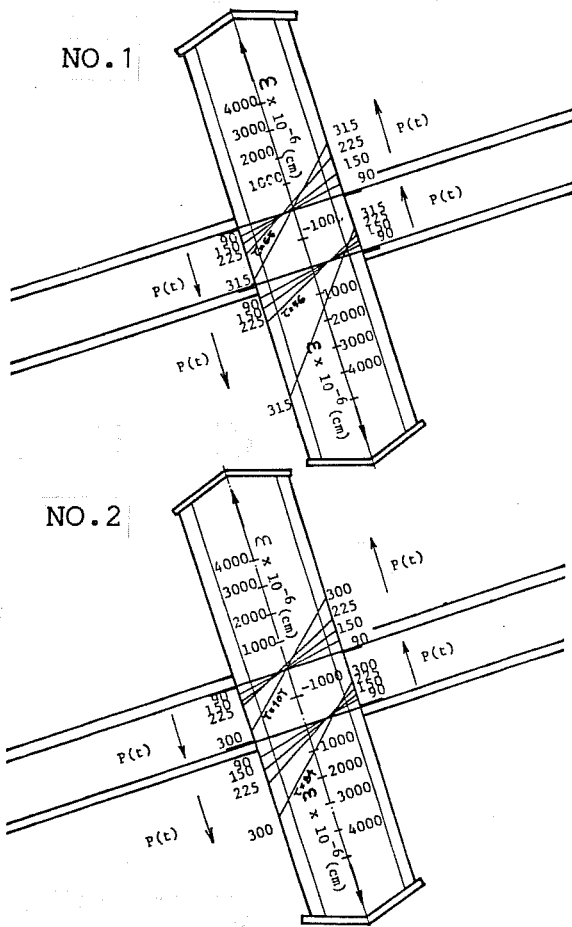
shows another series of interior joint tests.¹⁰ As shown in (a), four full-scale specimens were reinforced with D51 longitudinal bars and D16 transverse bars and were cast with 300 kgf/cm² concrete. The beam bar development length within the joint was 13 times the bar diameter and the beam bar bond index was 158 kgf/cm². Specimen No. 1 with two D51 beam bars failed in beam flexure and showed a stable load-deflection relation. On the contrary, the other specimens with three D51 beam bars failed in joint shear and showed considerable deterioration in resistance. The joint of Specimens No. 2 through No. 4 underwent large shear distortions as shown in (c). Bar slip measurements are shown in (d). Large bar slip occurred in the joint and caused large rotations at beam ends. It should be noted that the pull-out deformations were generally smaller than the push-in deformations. This is probably because the flexural cracks penetrated into the joint and the concrete slid with pull-out of the bars. Strain distributions along beam bars are shown in (e). The compressive strains at the
